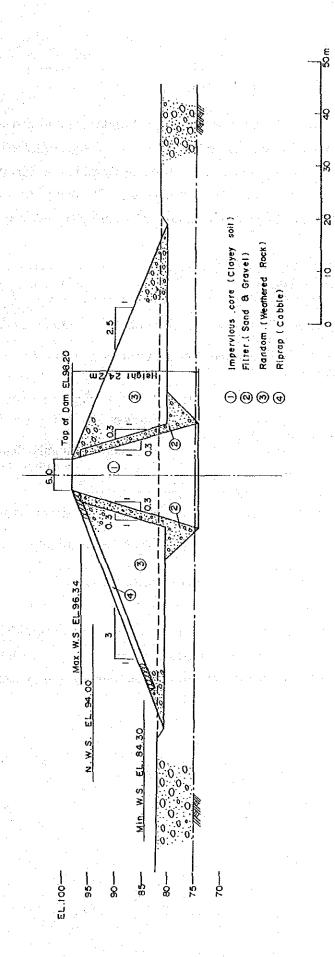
TYPICAL SECTION OF MANGILLOG DAM
